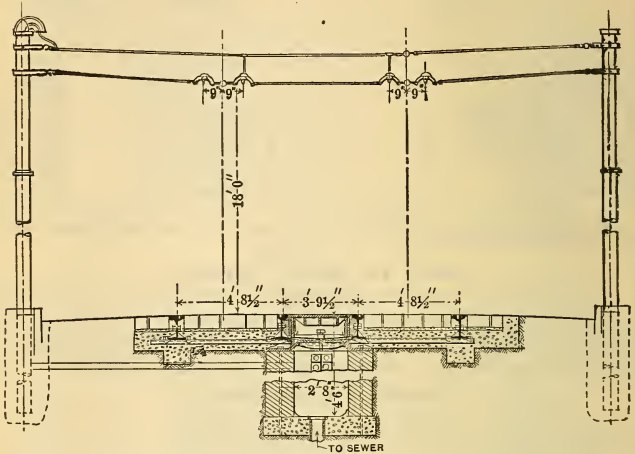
Section of Track and Overhead Construction in Broad Streets, showing Double Overhead Wires and Underground Feeder Conduits.
